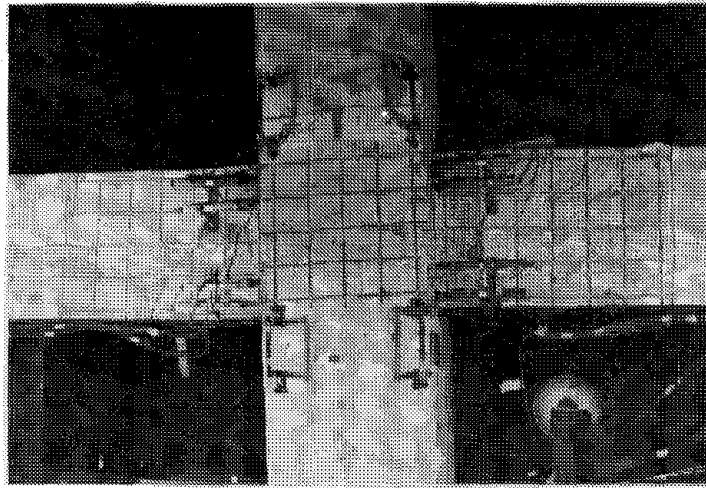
Deformed Shape of Subassemblage BC4 at LP 23
